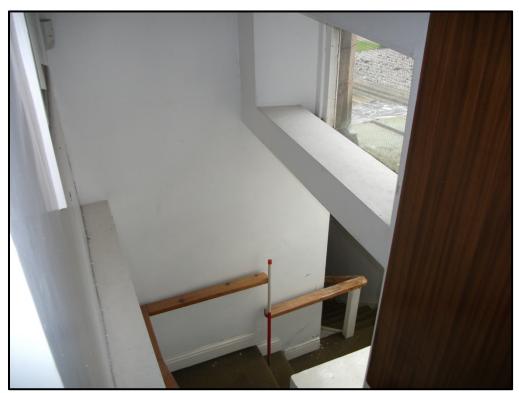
View of the Upper Stairwell (F7).Looking north-west
